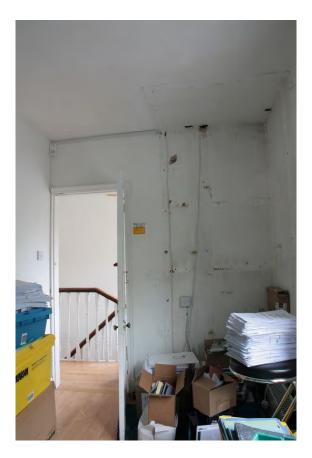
First Floor Store Room, looking north-east (LMSC16 D100 (76))
